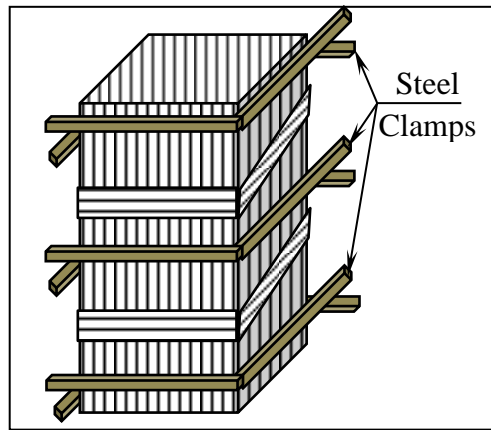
Typical Formwork Setup for a Concrete Wall
